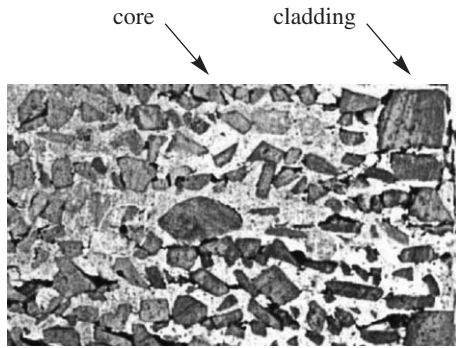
A section of a wall of the Civic Tower of Pavia cut from a block that survived collapse (after [5]).
